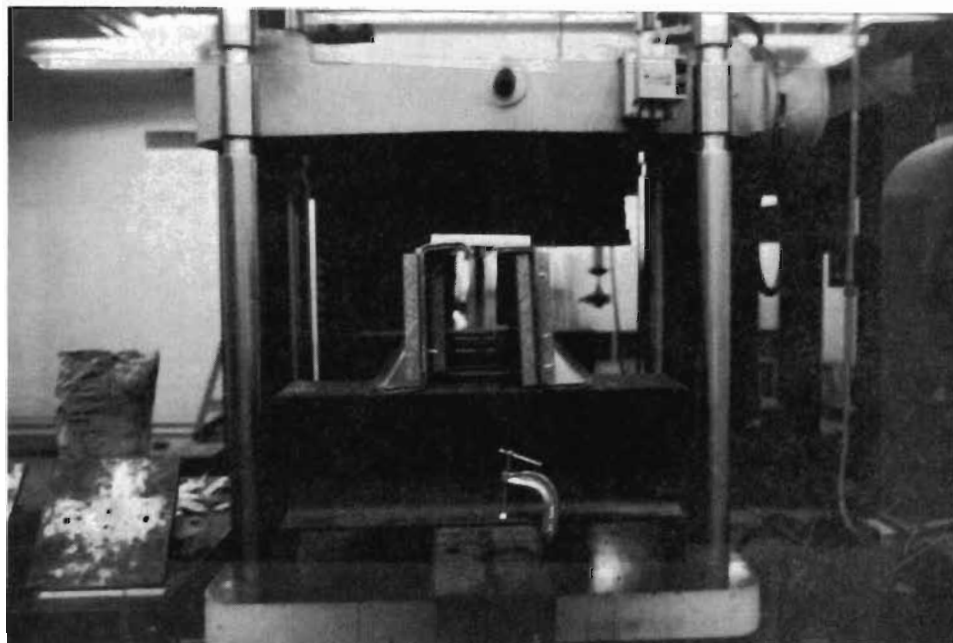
Photograph of a Typical Failure of an Unlapped Z-Section Subjected EOF Loading with Restrained Flanges.
